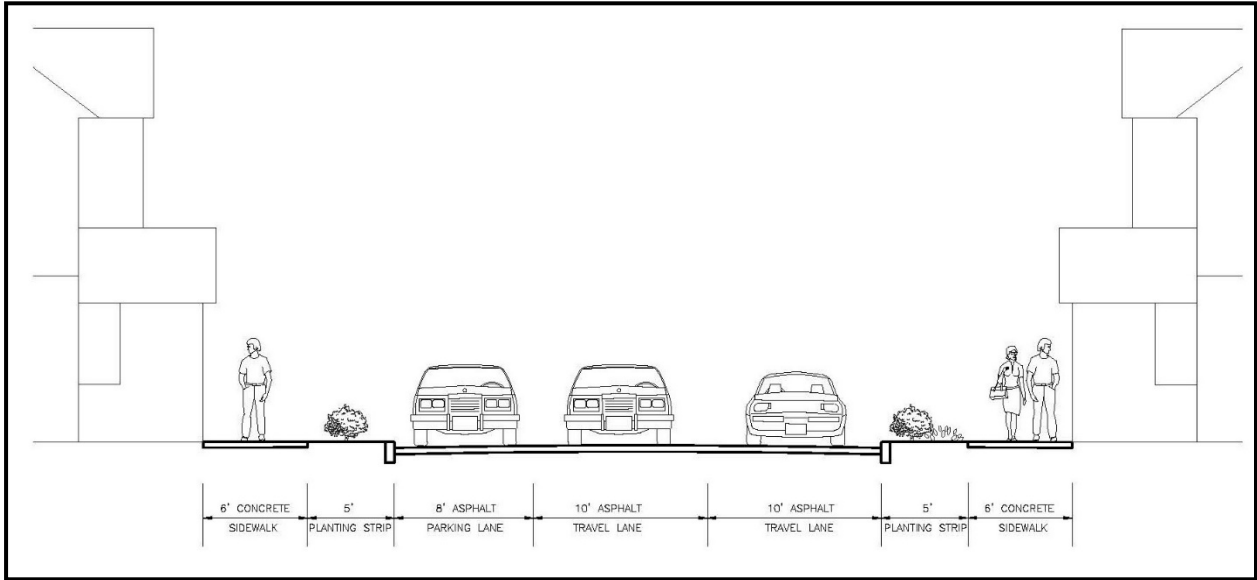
Commercial Connector Roads in Planned Development – Proposed Roadway Section TC-55
